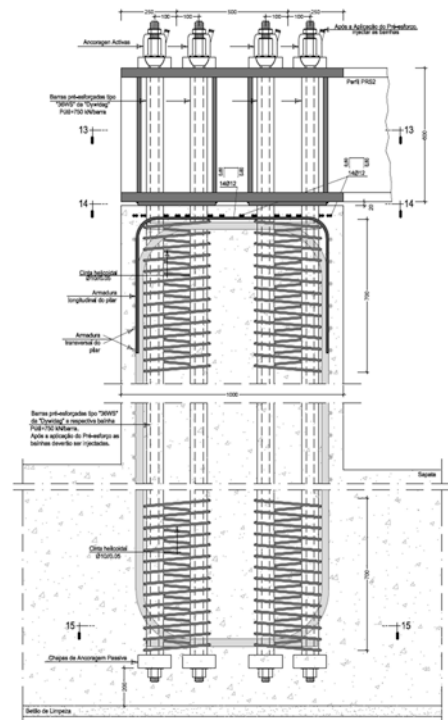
Detail of the connection of the steel structure with the concrete wall - cross section
